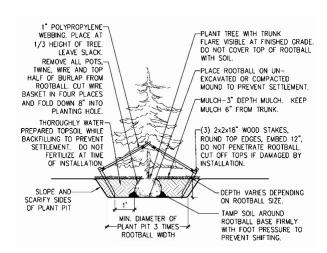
EVERGREEN TREE PLANTING DETAIL
